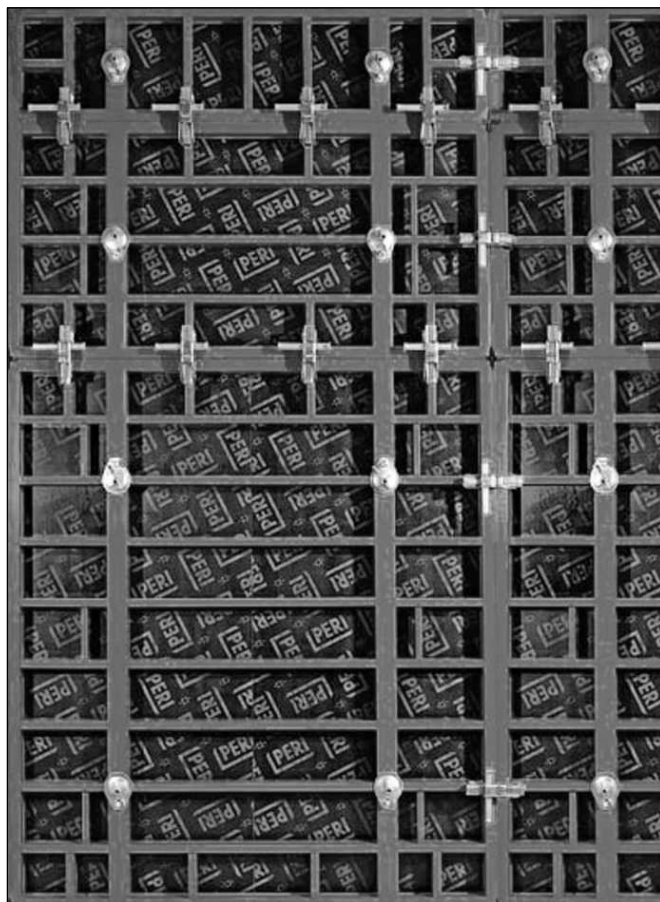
Maximo Panel Wall Formwork (Courtesy PERI).
